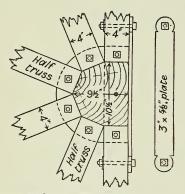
Composite Roof Truss for Span of 35 ft. to 45 ft.
